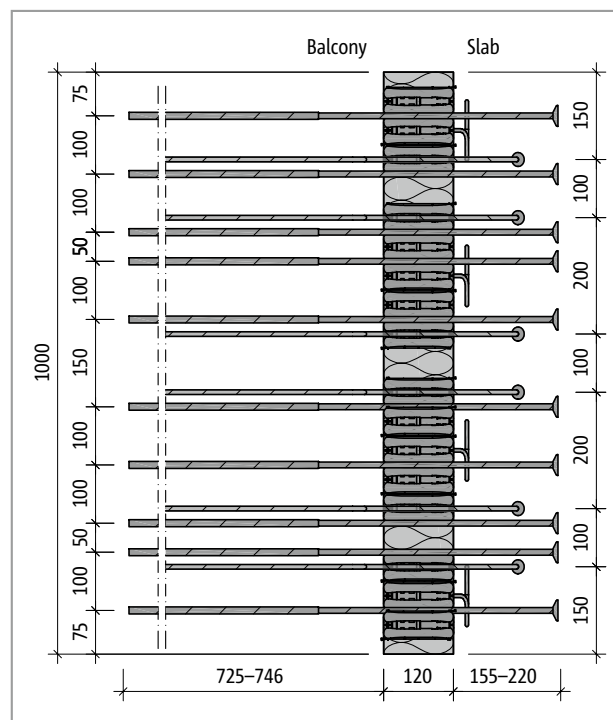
Schöck Isokorb® XT type K-U-M4: Product plan view
